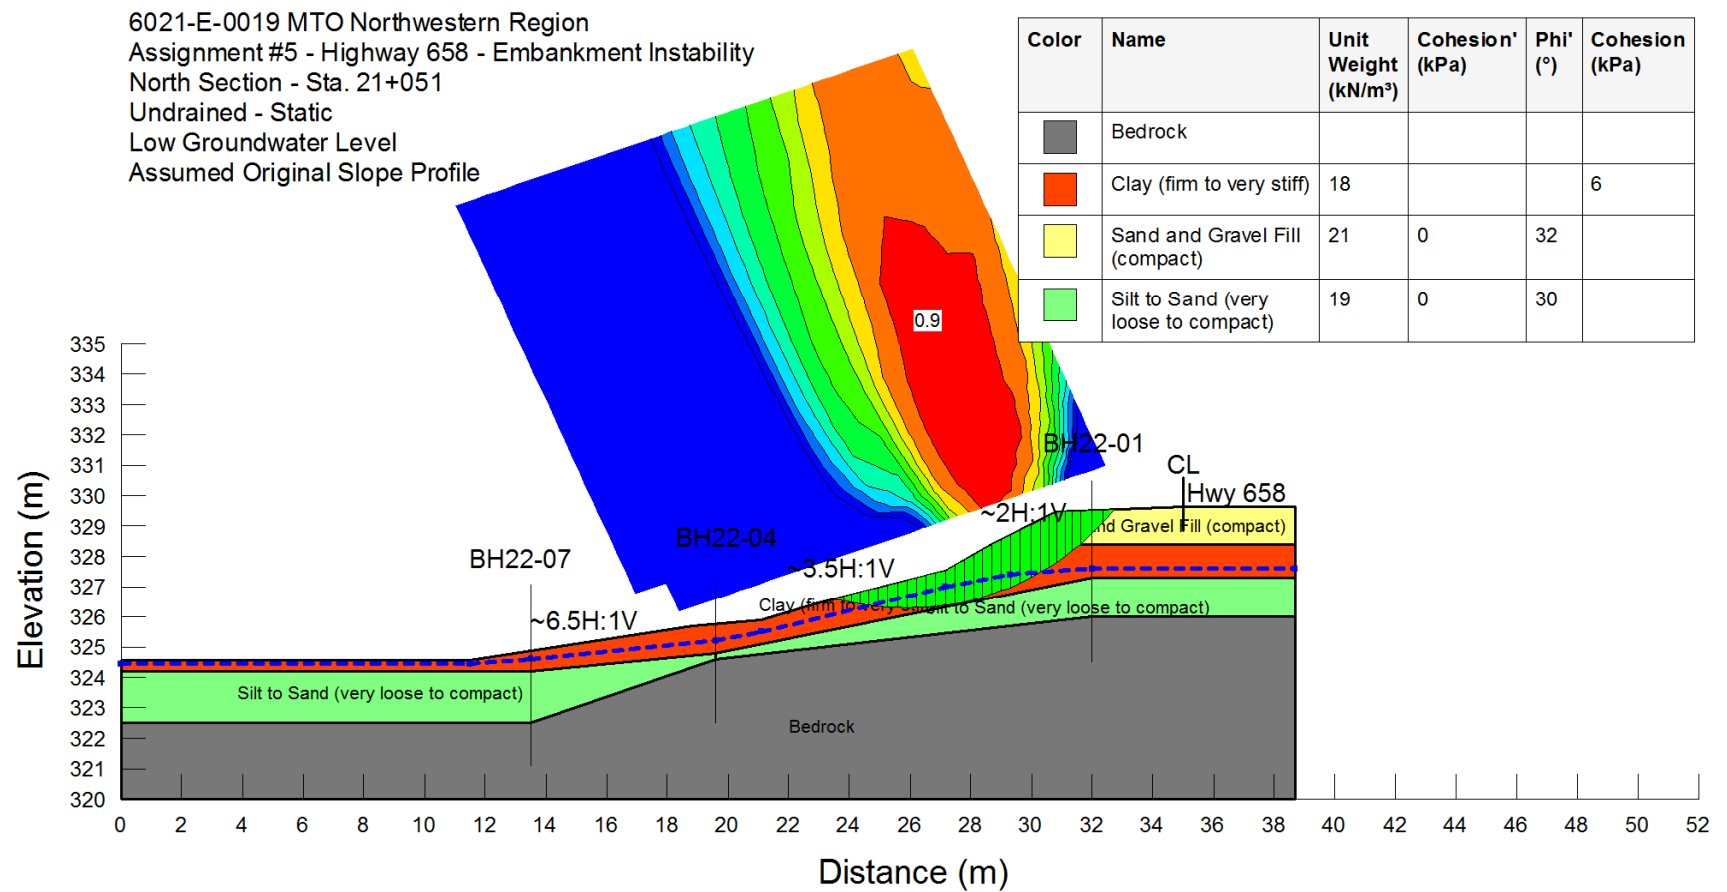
North Section D-D' (Sta. 21+051) – Slope Prior to 2022 Failure, Assumed Original Slope Profile, Low GWL – Undrained Static Conditions
